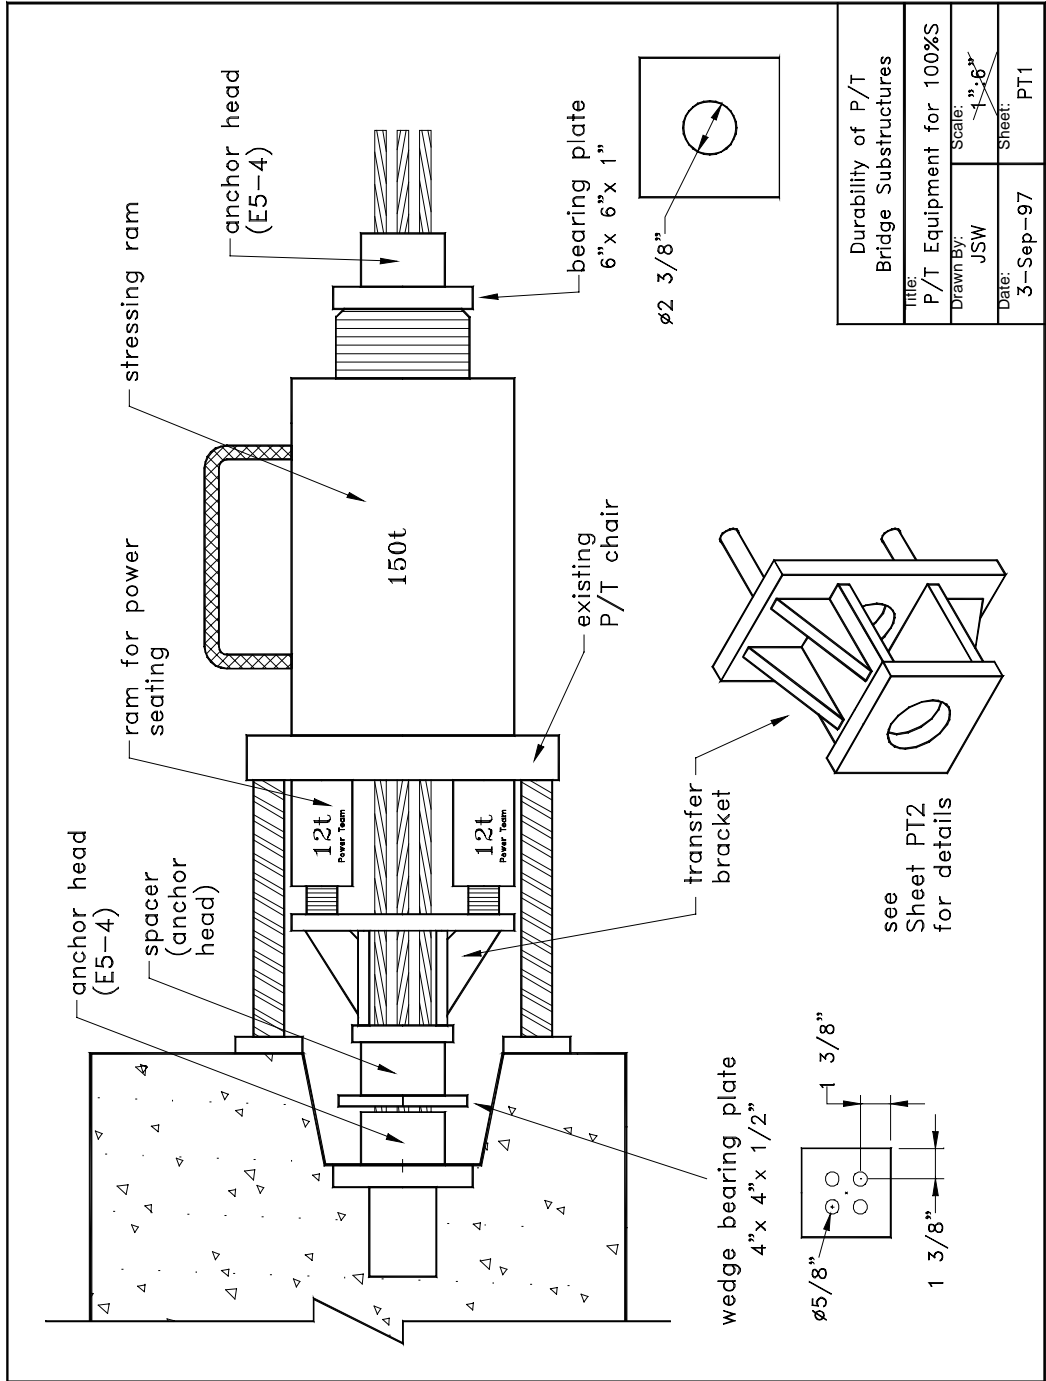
Sheet PT1: Post-Tensioning Equipment for 100%S Beams
